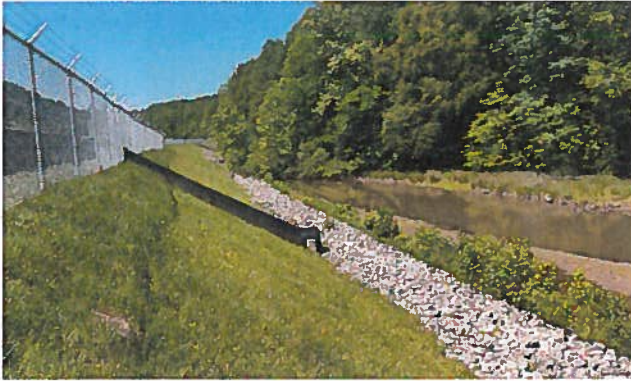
Typical view of the reclaim' s pond 36 inch diameter HDPE overflow pipe showing good conditions with no obstructions to flow and no visible erosion.
